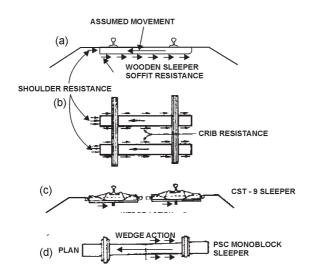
(a) Soffit resistance (b) Crib and shoulder resistance (c) Keying action CST9 sleeper and (d) Wedge action in monoblock PSC sleeper On long welded rails where build-up of thermal forces occurs, special care is therefore required to be taken in summer to ensure that lateral and longitudinal ballast resistances are not allowed to become low. Prior to onset of summer, distressing of LWR shall be completed if the behaviour of LWR warrants the same. Special precautions during summer on LWR includes, introduction of hot weather patrol when necessary, undertaking track maintenance works strictly within the permitted temperature ranges, etc.
